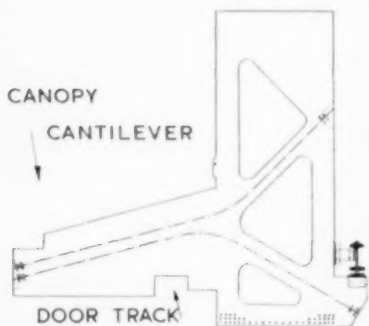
Elevation of Precast Diaphragm in Main Beam.
